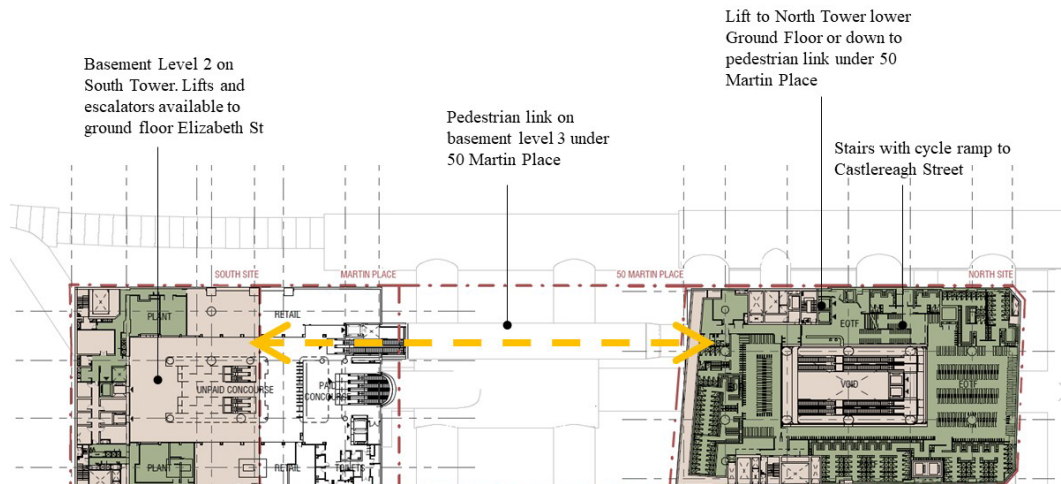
Internal pedestrian connection between South Tower and end of trip facilities
